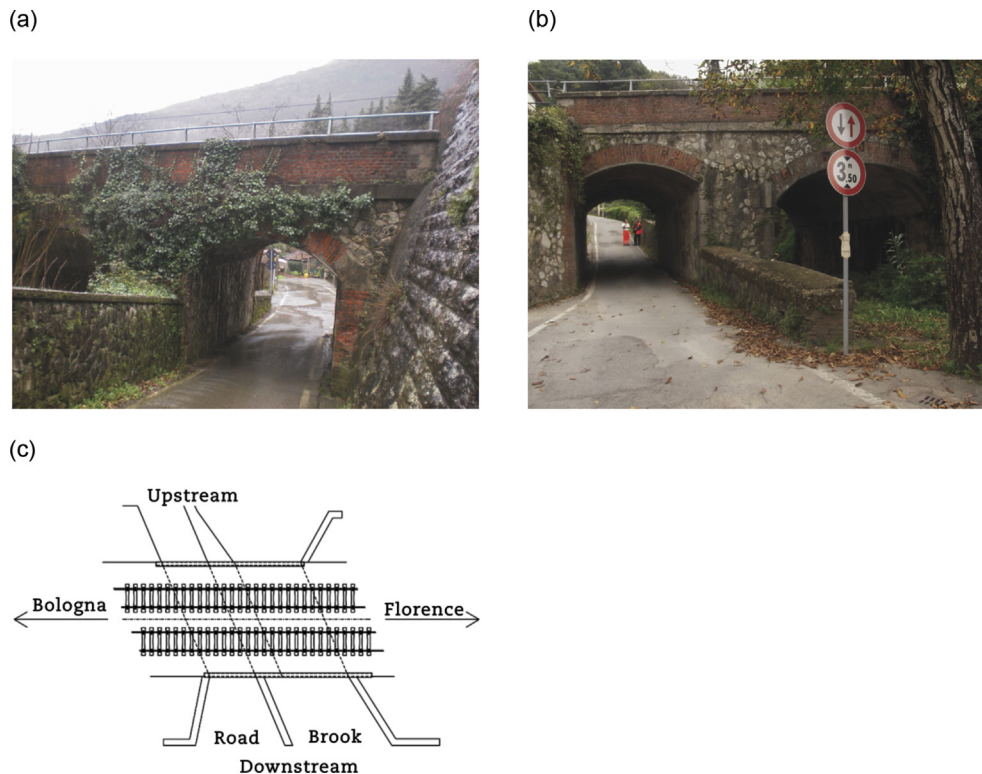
Global view of the investigated railway masonry arch bridge. (a) Upstream view. (b) Downstream view. (c) Plan view.
